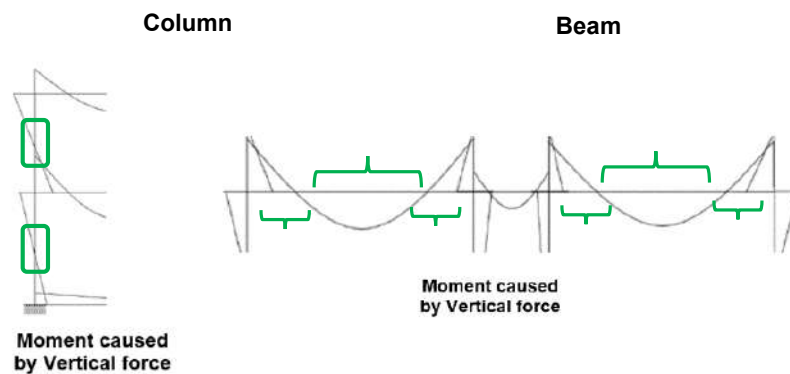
Condition of Stirrup/ Hoop arrangement
